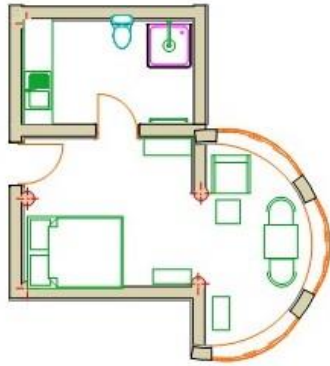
Plan view of the Stardom hotel single room. (Author,2020)
